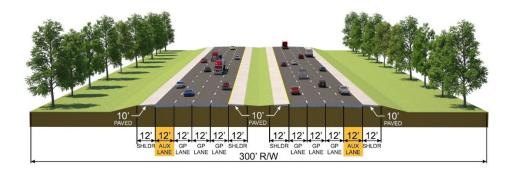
| Auxiliary Lanes Alternative Typical Section
